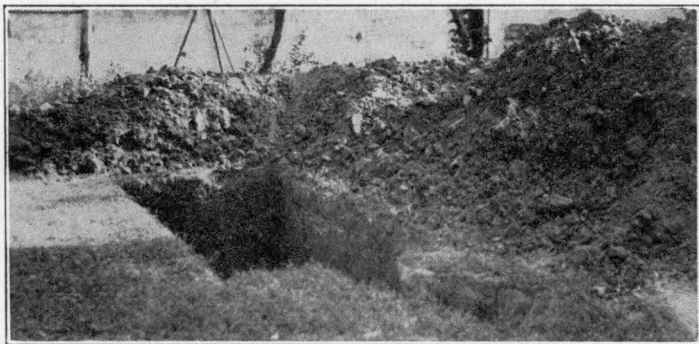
THE EARTH WALLS MAY SERVE AS OUTSIDE FORMS FOR THE CONCRETE
